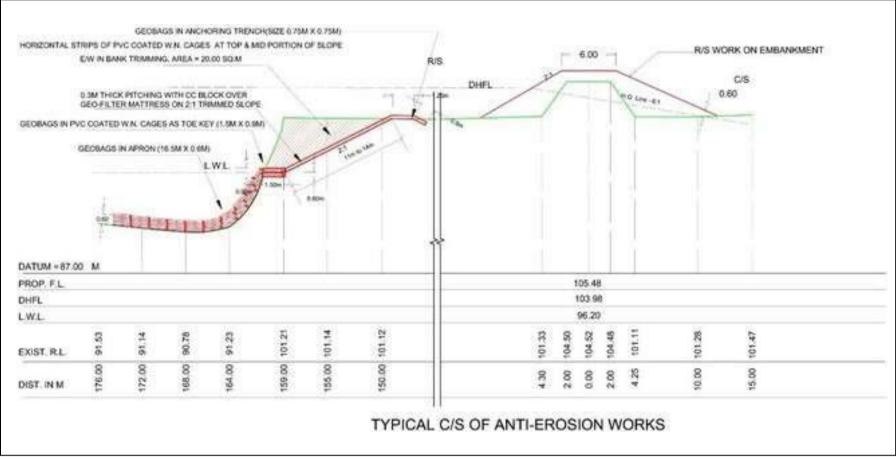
Typical Cross-Sections of Proposed Anti-Erosion and Embankment Works
